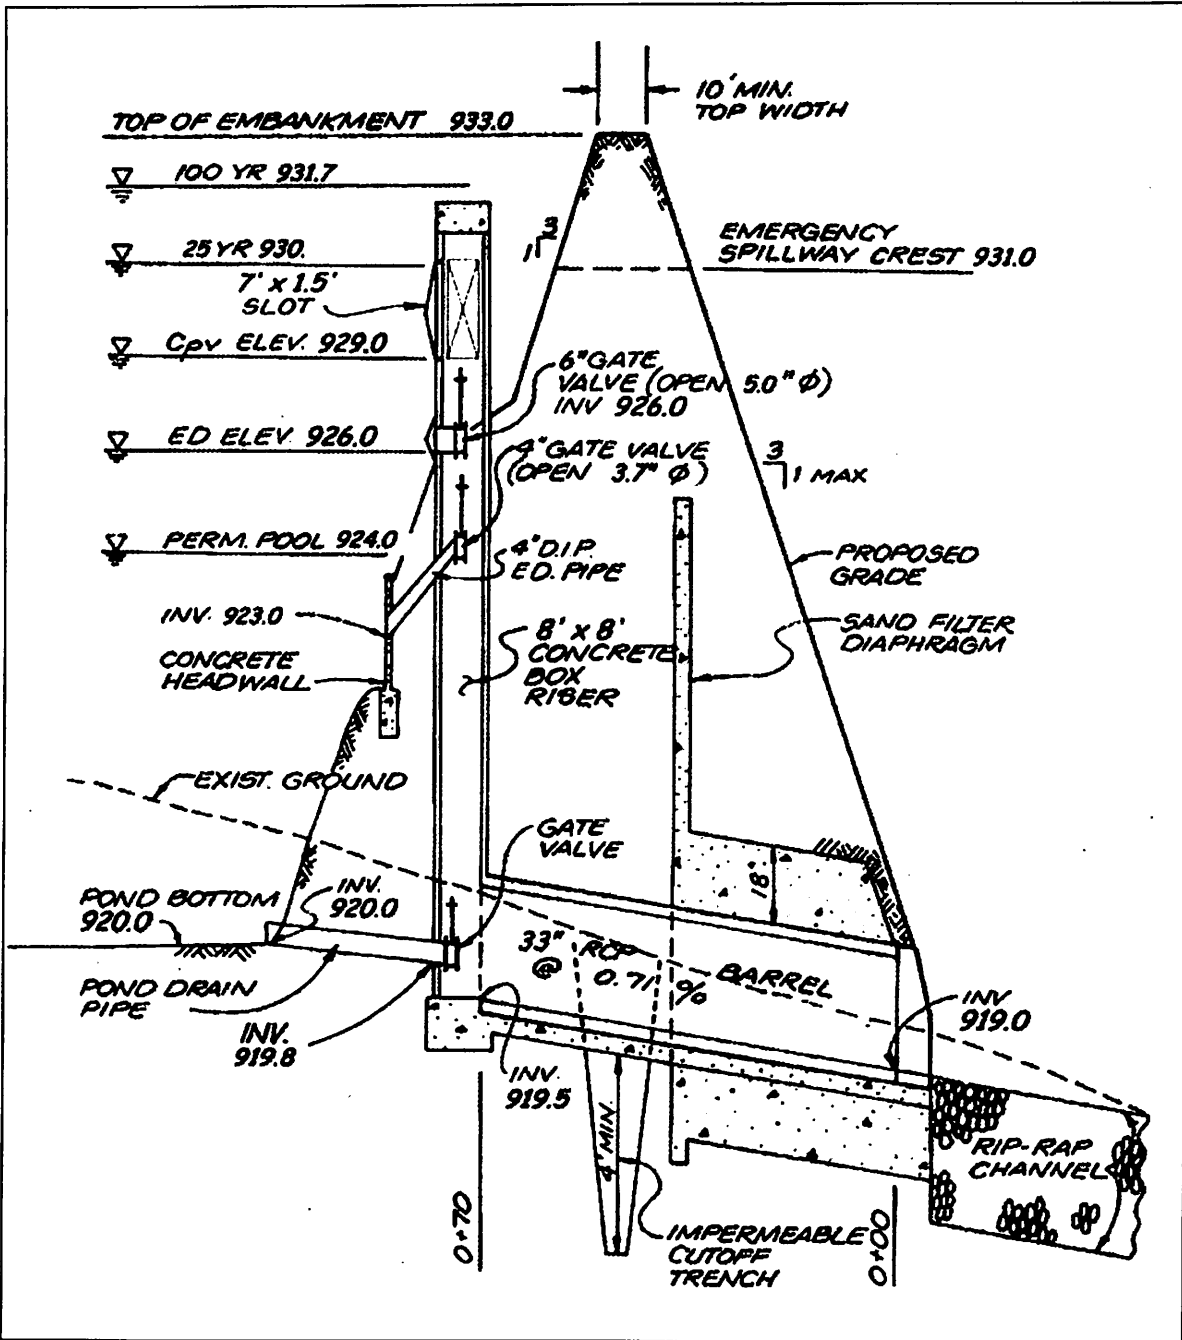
Example of Unified Sizing Criteria Outfall Structure Details
